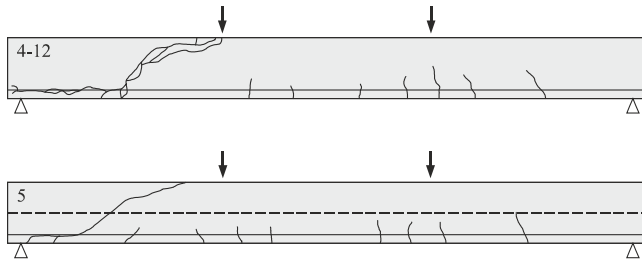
Fatigue failure due to concrete compression failure (up) or concrete diagonal tensile failure (down) according to CHANG / KESLER [Cha- b1958]
